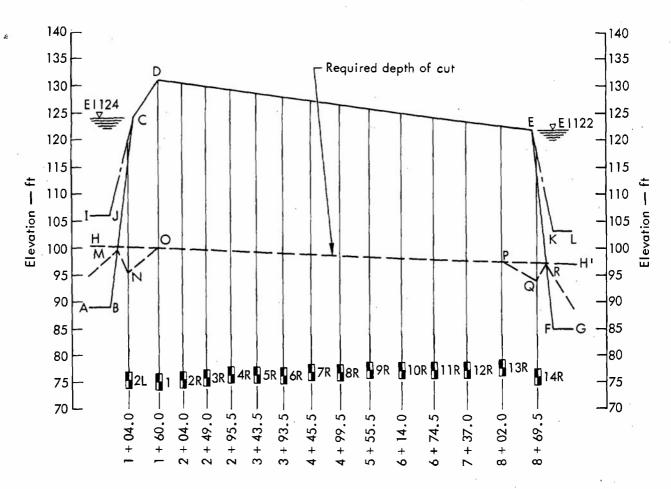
Project profile showing stations, elevations, required depth of cut, and charge positioning.
